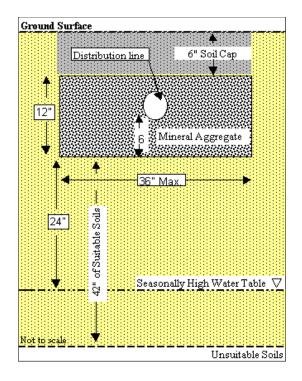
Cross-section of a Standard Trench Drainfield System
